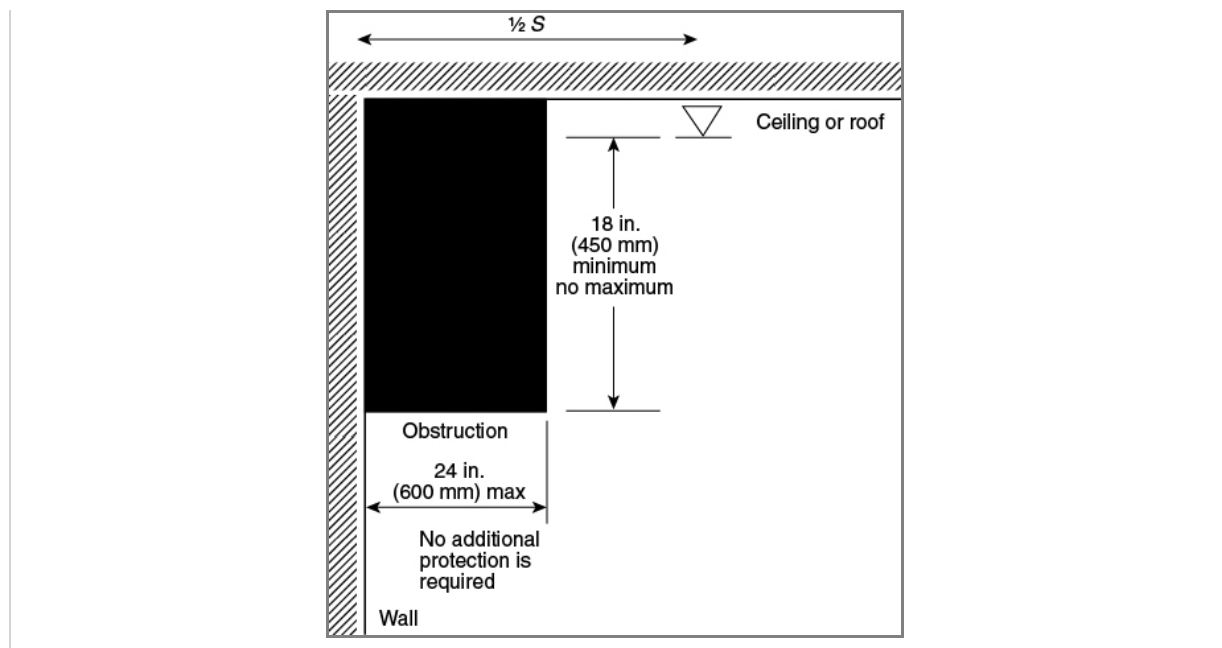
(c) Obstructions Against Walls (Extended Coverage Upright and Pendent Spray Sprinklers).
